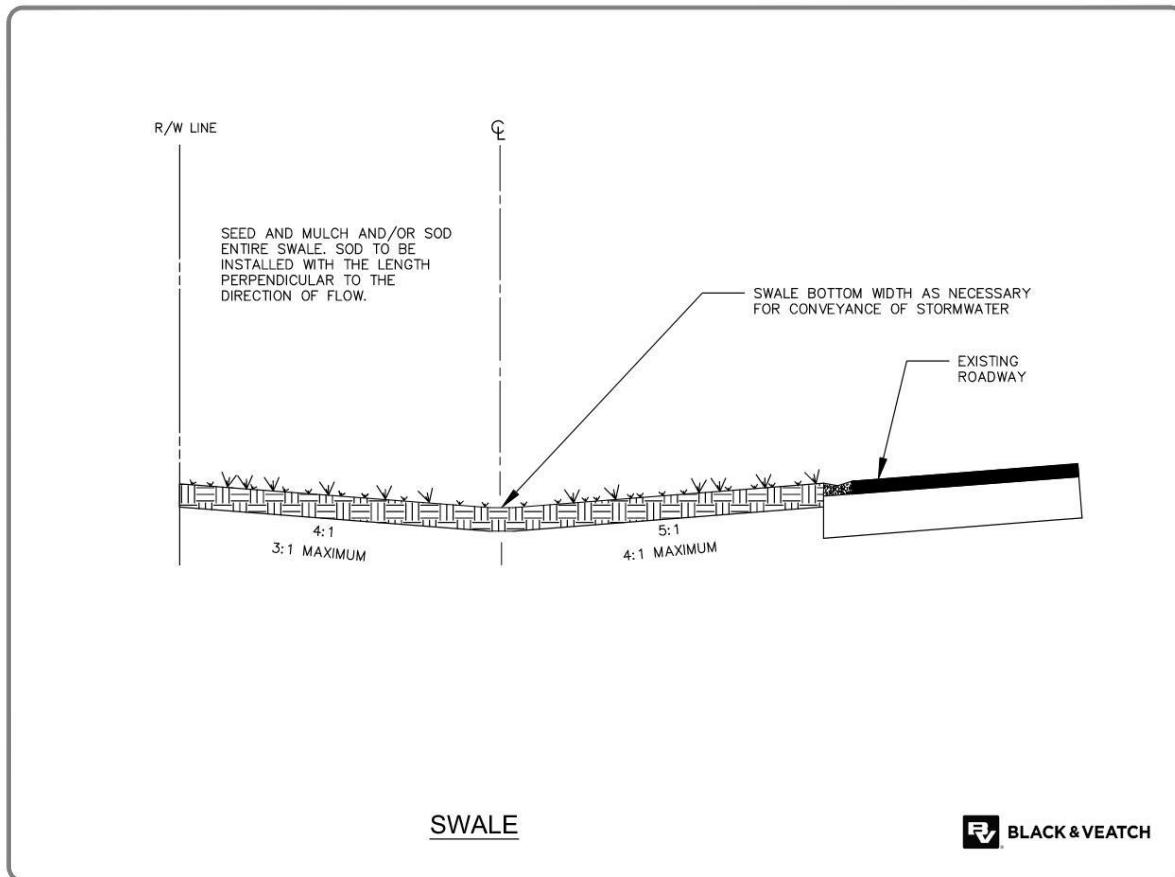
Standard Detail Depicting a Typical Roadside Swale Design
